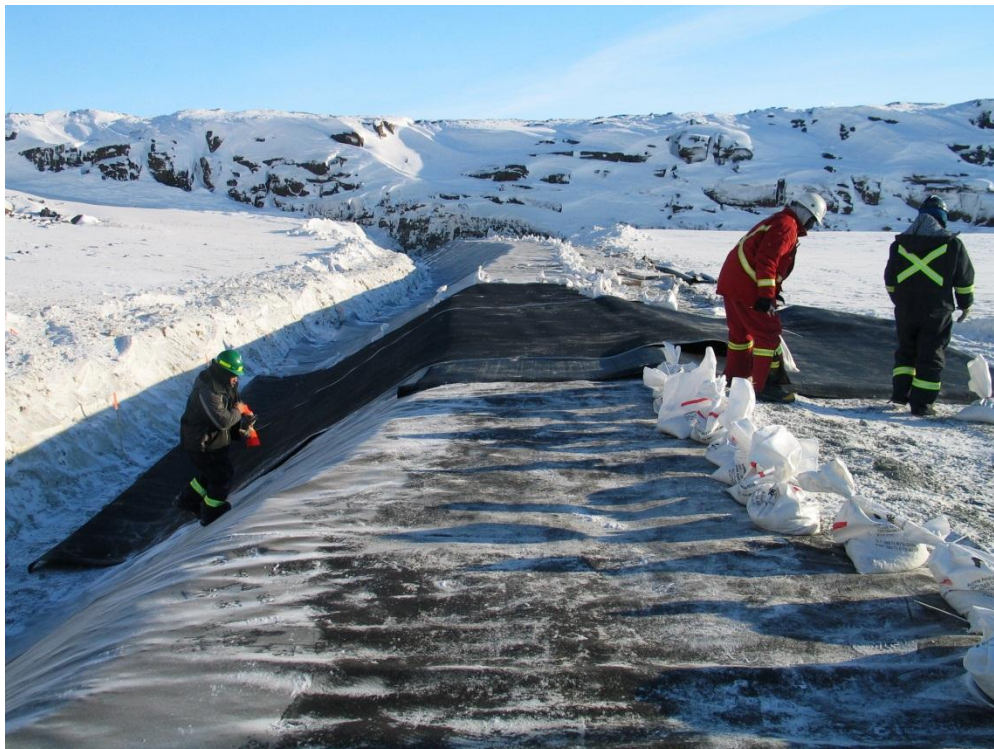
Layfield installing HDPE liner at the Doris North Diversion Berm.
